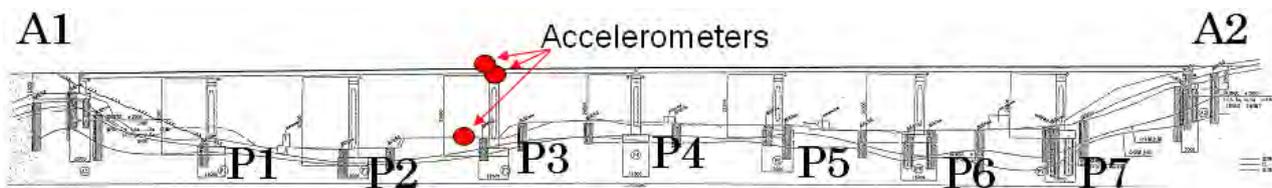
Section of Yamada viaduct with locations of accelerometers.
